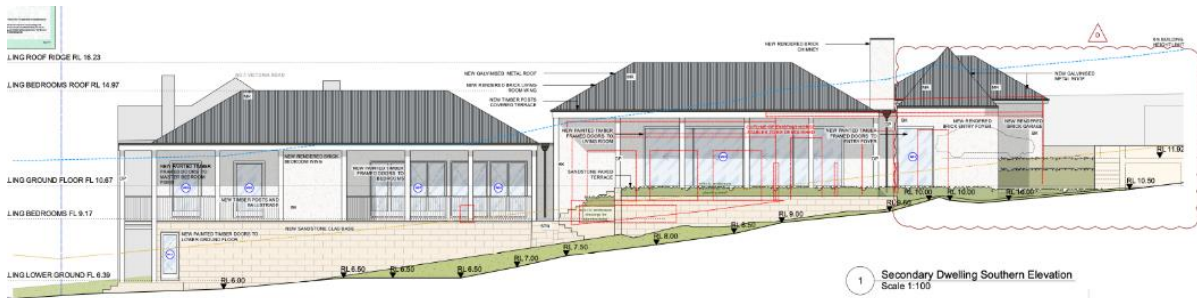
Proposed south-west (side) elevation – Dwelling 2
